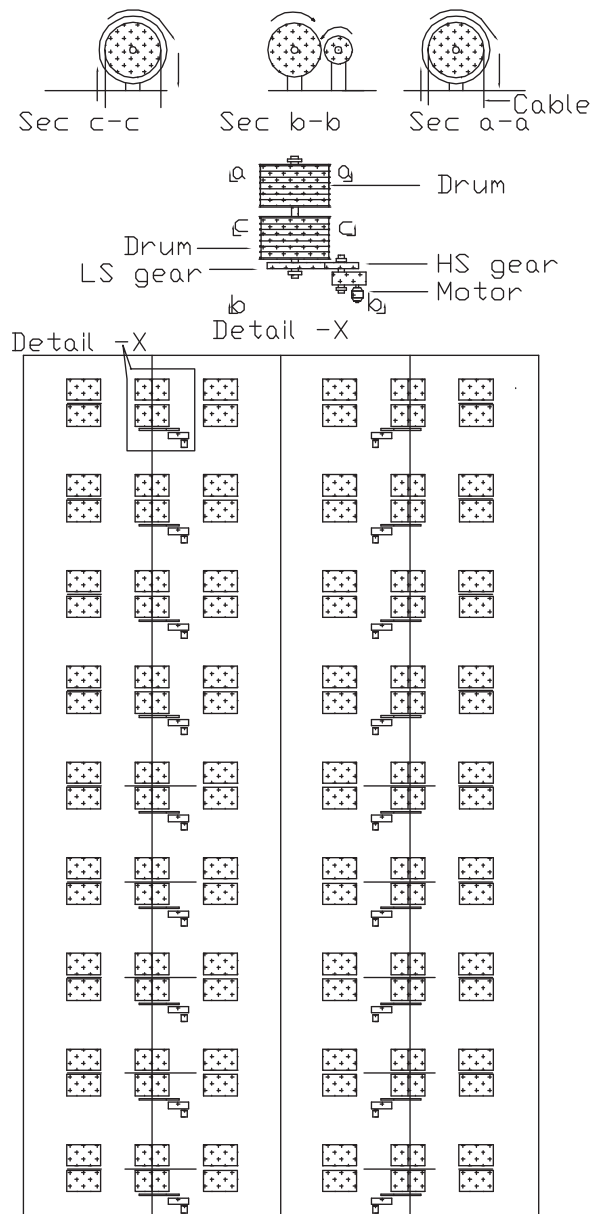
Schematic plan of machine room of EB with arrangement of winch drives.
